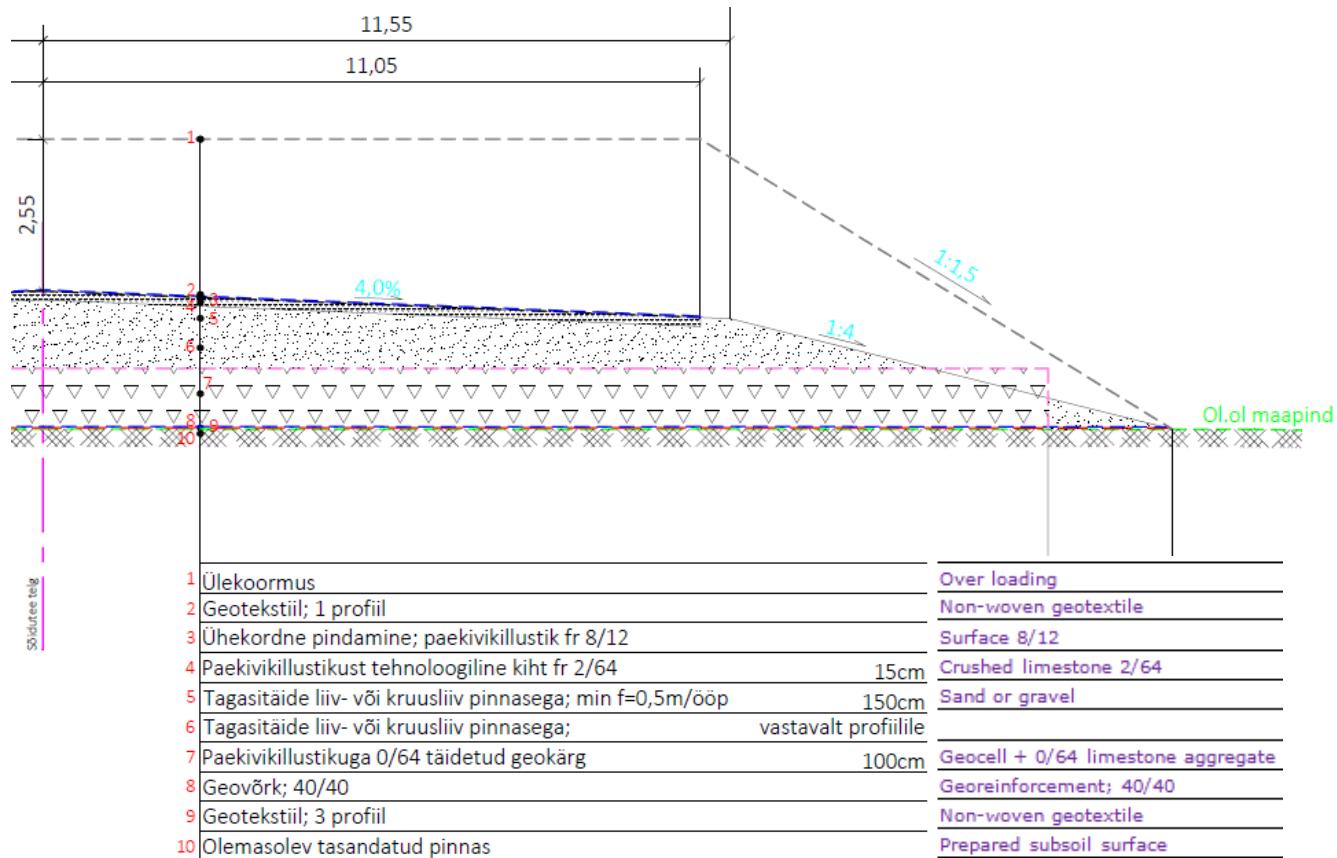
Cross-section of test section 3. Geocell-structure (1m) on top of georeinforcement.
